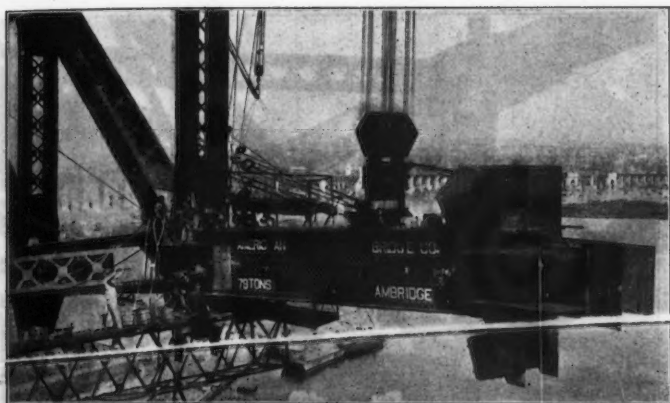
CONNECTING BOTTOM CHORD MEMBER, HELL GATE BRIDGE.
